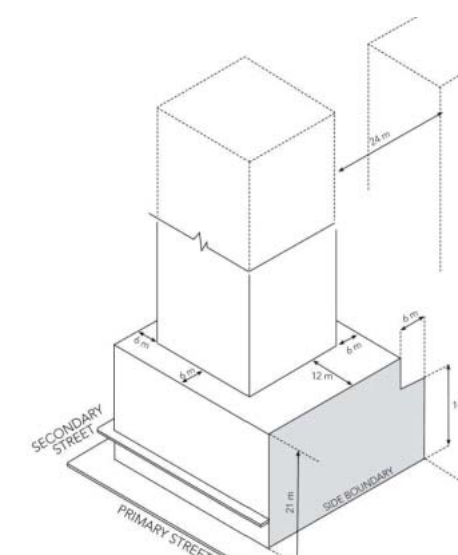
Tower on a Podium/Corner Site - Draft Liverpool Development Control Plan 2008
